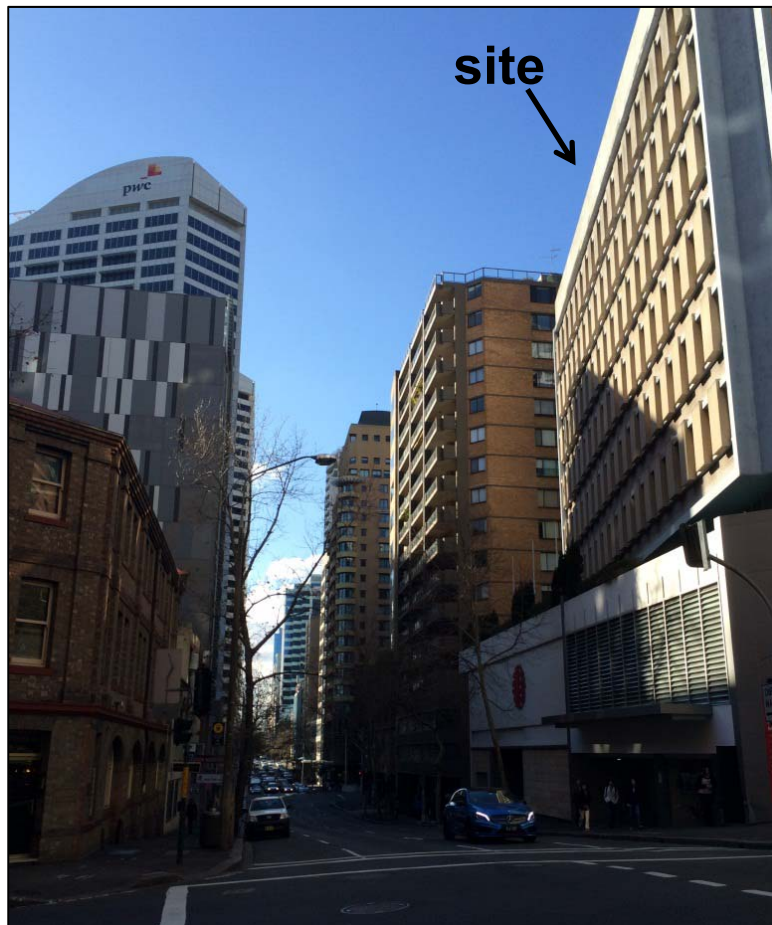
The site as viewed from the intersection of Bathurst and Sussex Streets looking north
